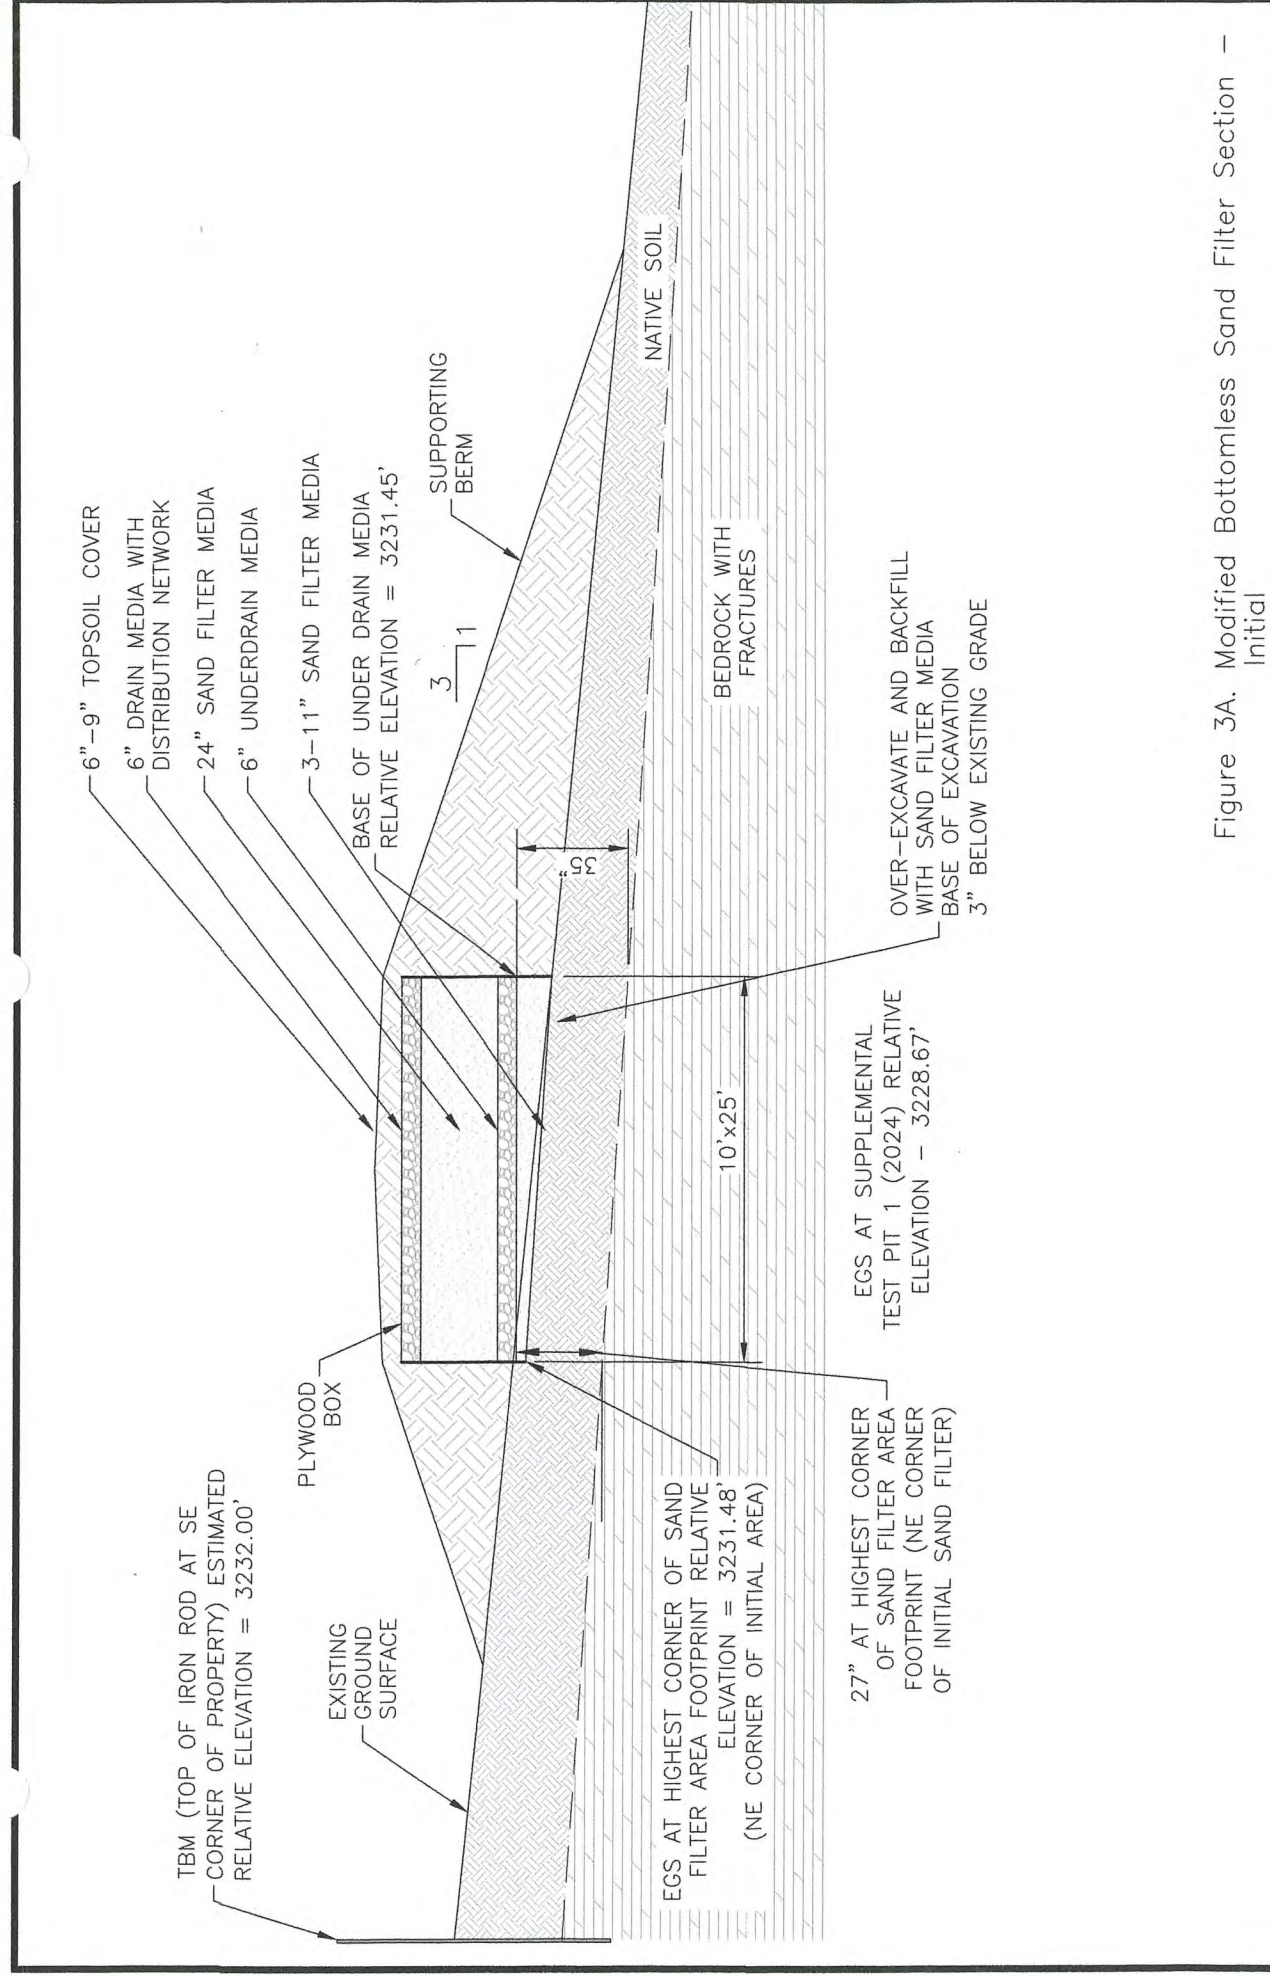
A. Modified Bottomless Sand Filter Section - Initial
